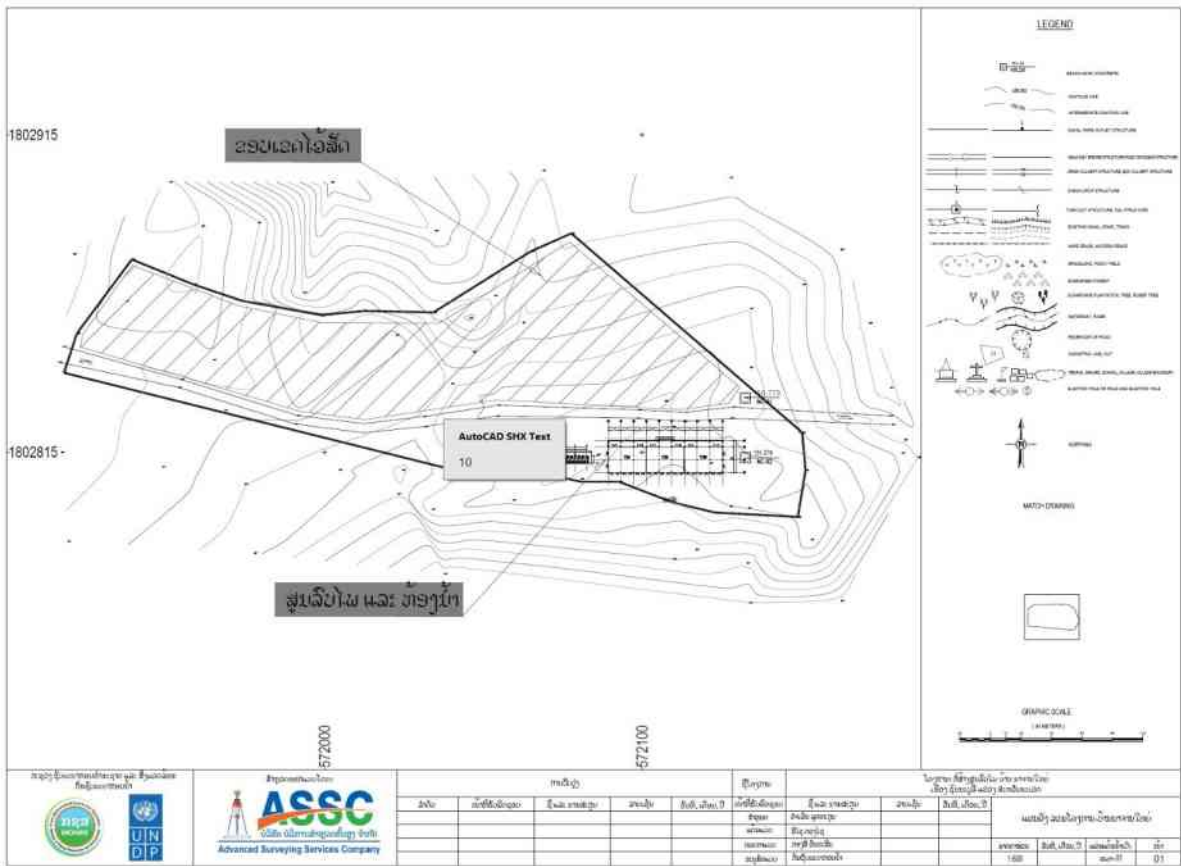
Drawing of flood evacuation shelter in Nachanyai Village, Xonnabouly District
